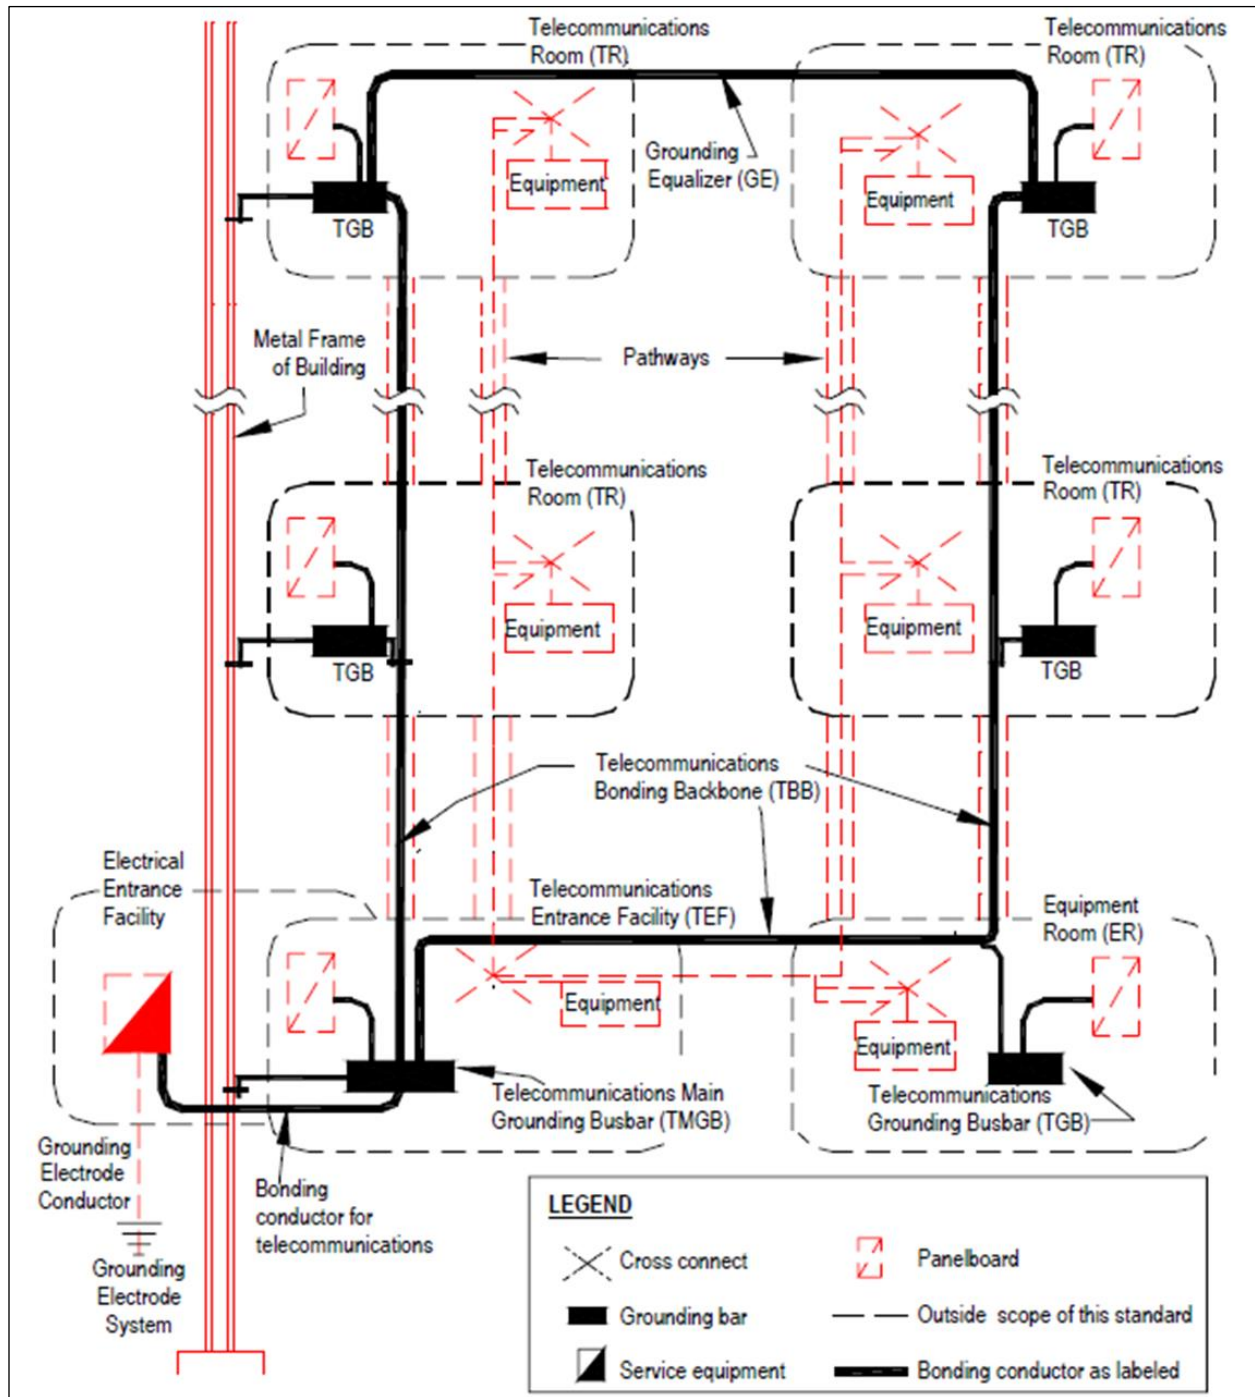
Four telecom rooms (IDFs), one entrance facility, and one electric room (MDF) are connected to each other and the designated ground source. The legend shows cross connects, panel boards, grounding bars, outside scopes, service equipment and bonding conductors.
